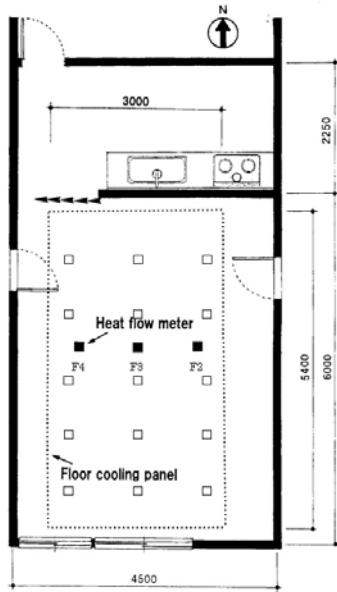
Plan of a room with floor cooling panel and arrangement of heat flow meter.
